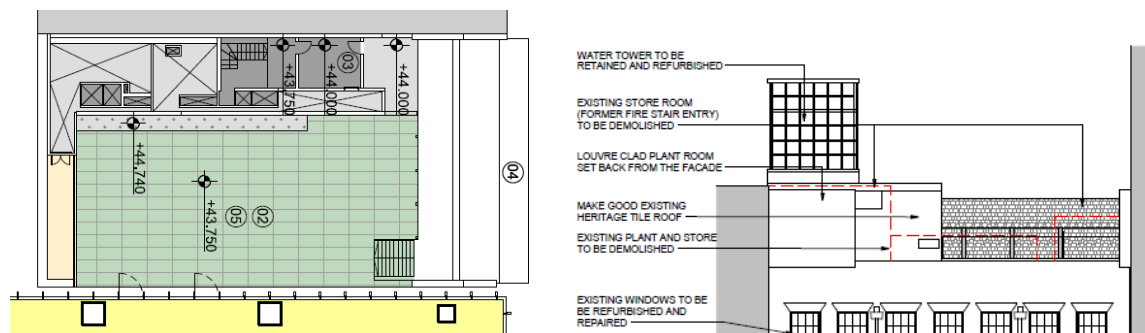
Left: The existing approval for this building at this level is for a roof terrace green shaded area, accessible from the new office space directly to the south. Right: West elevation showing overall approved works. (Source: Make Architectus, DA2014, Rev 3 September 2016, and DA2301, Rev 2 September 2016)
